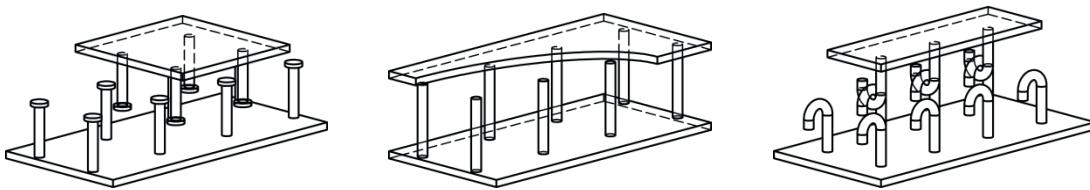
Sketch of (a) double-skin, (b) Bi-Steel, and (c) an alternative SCS sandwich construction
